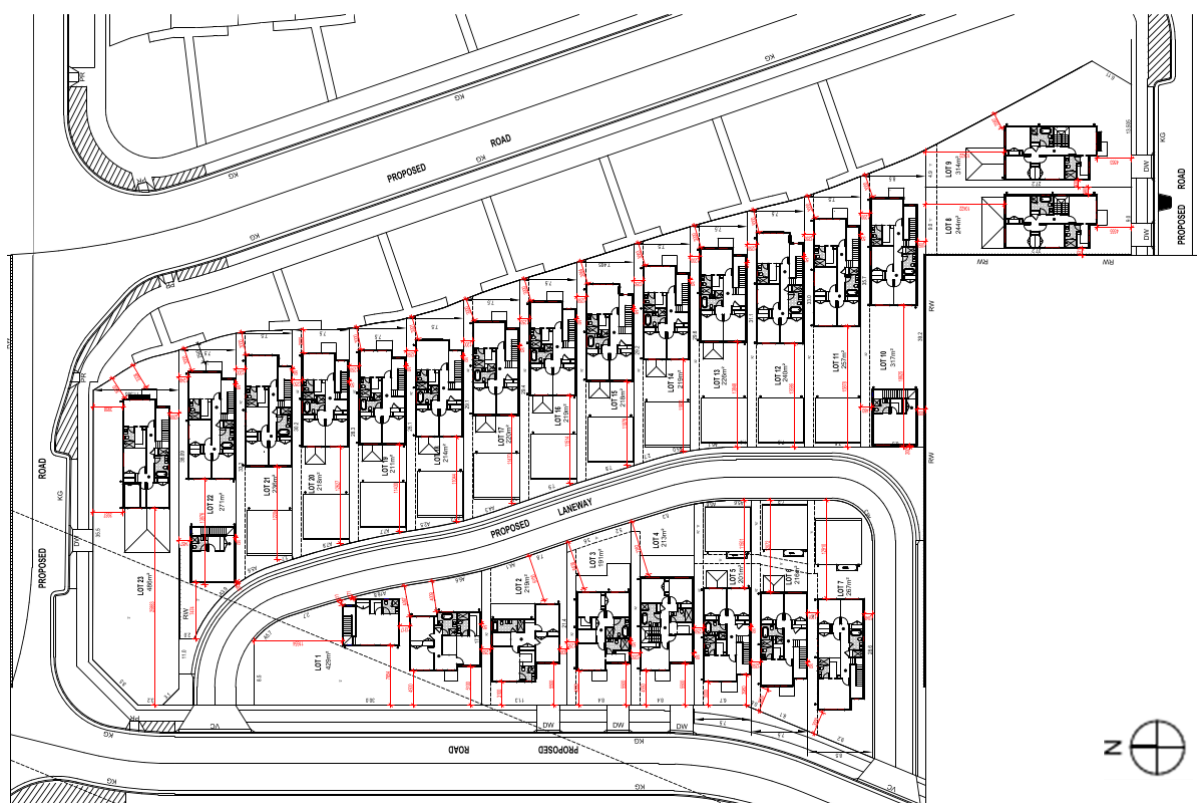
Stage 2 – First Floor Plans - Western Allotment (Source: New Living Homes)
